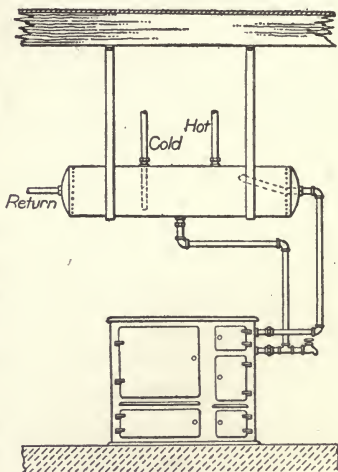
Method Designed to Favor Quick Supply to Fixtures.
